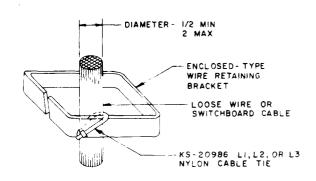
Securing Installer-Run Loose Wire to Enclosed-Type Retaining Brackets With Nylon Cable Ties
